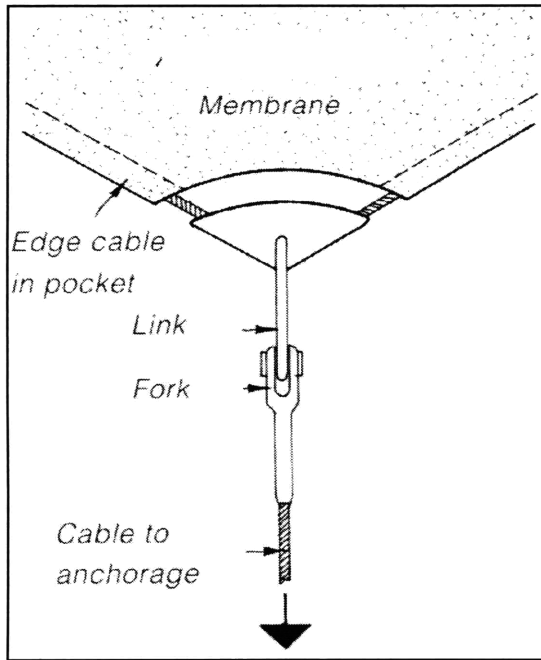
Typical edge cable detail at one of the perimeter locations where stresses are taken out of a membrane into the surrounding structure.
